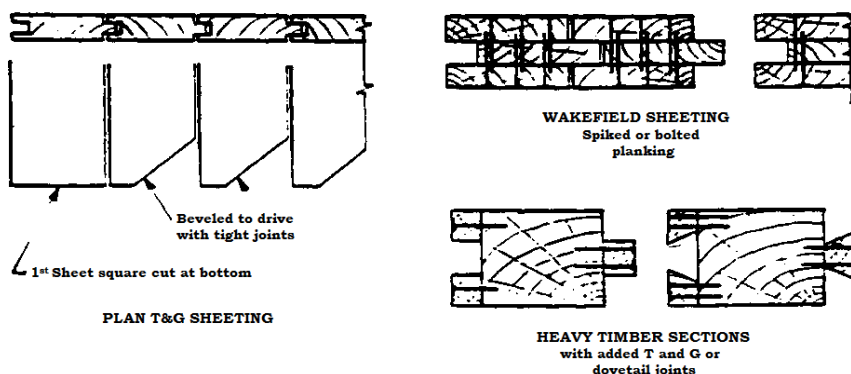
Types of Wood Sheet Piling ⁽³²⁾
